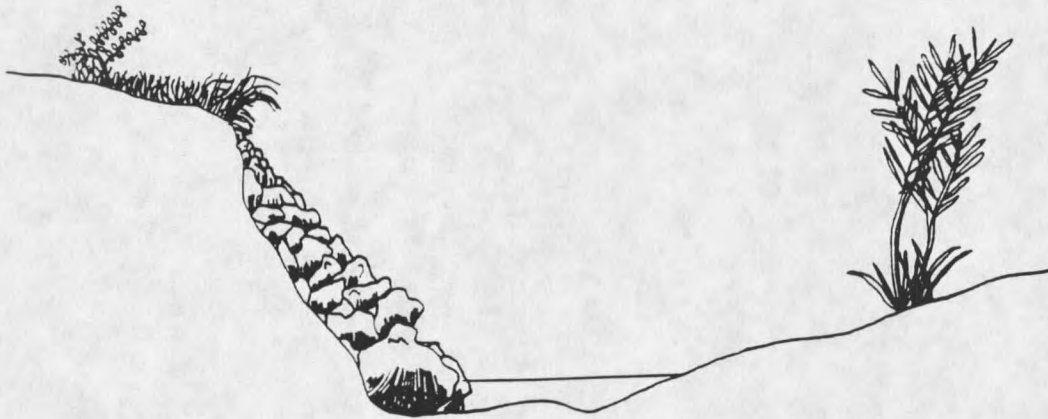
Cross section of riprap revetment. Typical thalweg was 25-30 cm at "normal" low flow (285 L/s).
